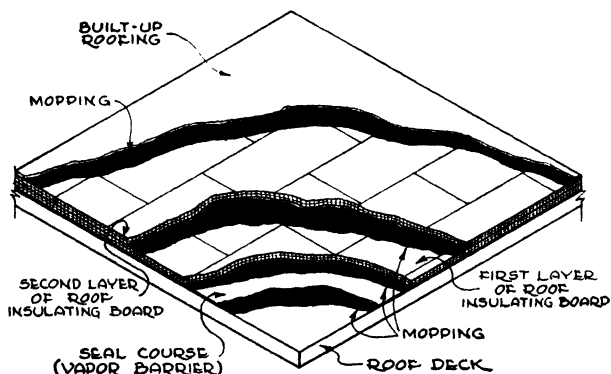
Typical Roof Deck with Vapor Barrier, Two Layers of Roof Insulation Board, and Built-up Roofing
